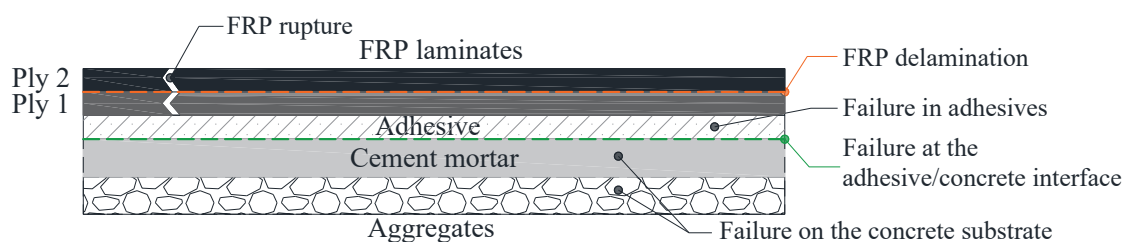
Typical failure modes of EB FRP in concrete under fatigue loading
